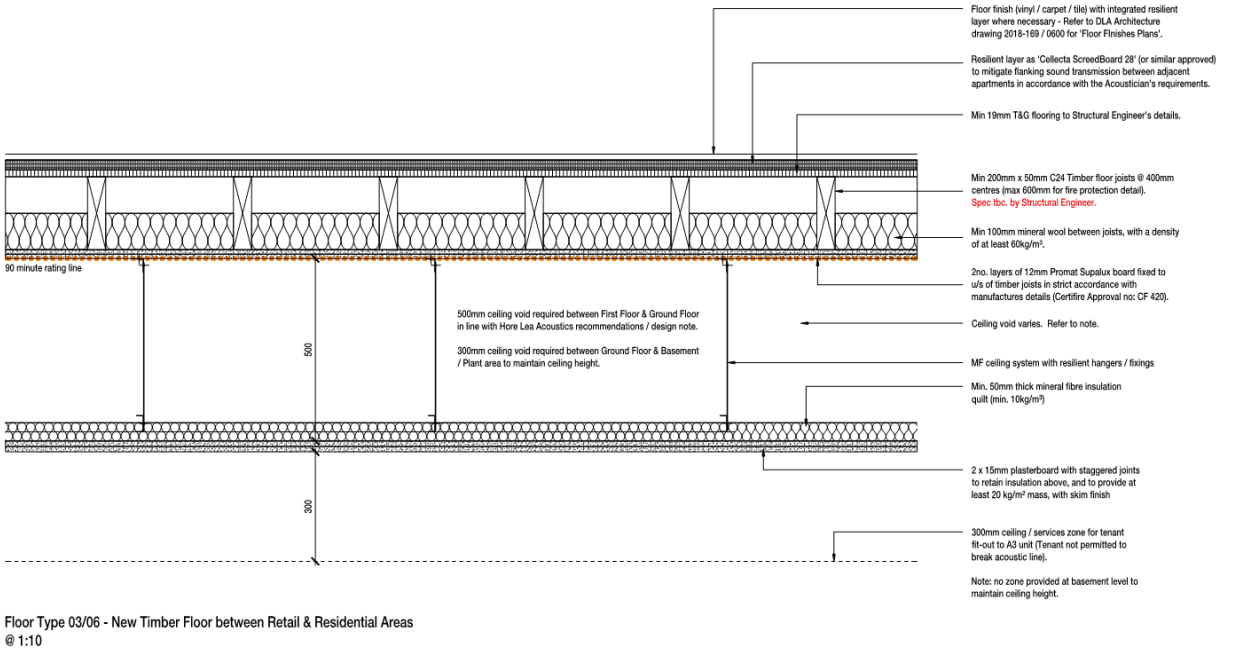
Proposed new-build timber floor build-up between apartment units and A3 commercial unit below
